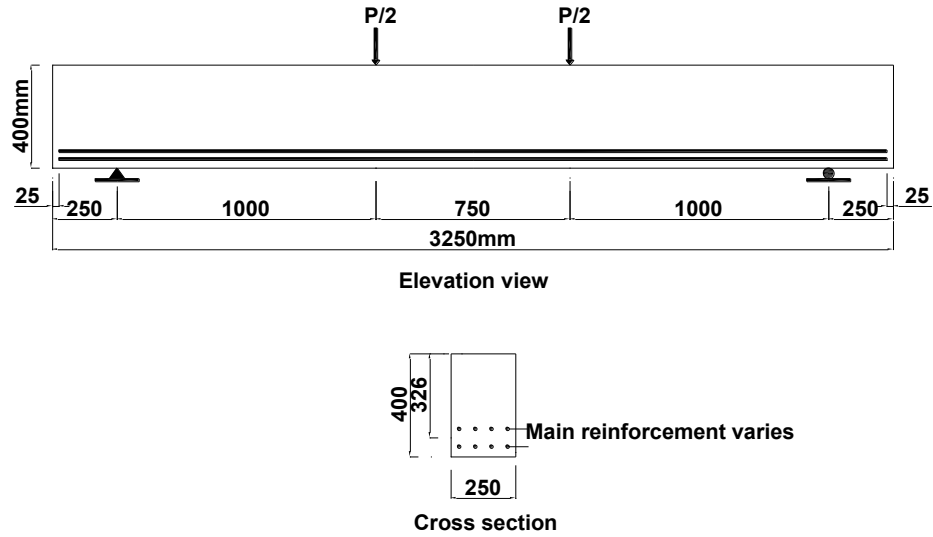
(a) Test setup and the dimensions; and (b) sectional details. El-Sayed et al. [2006b]
